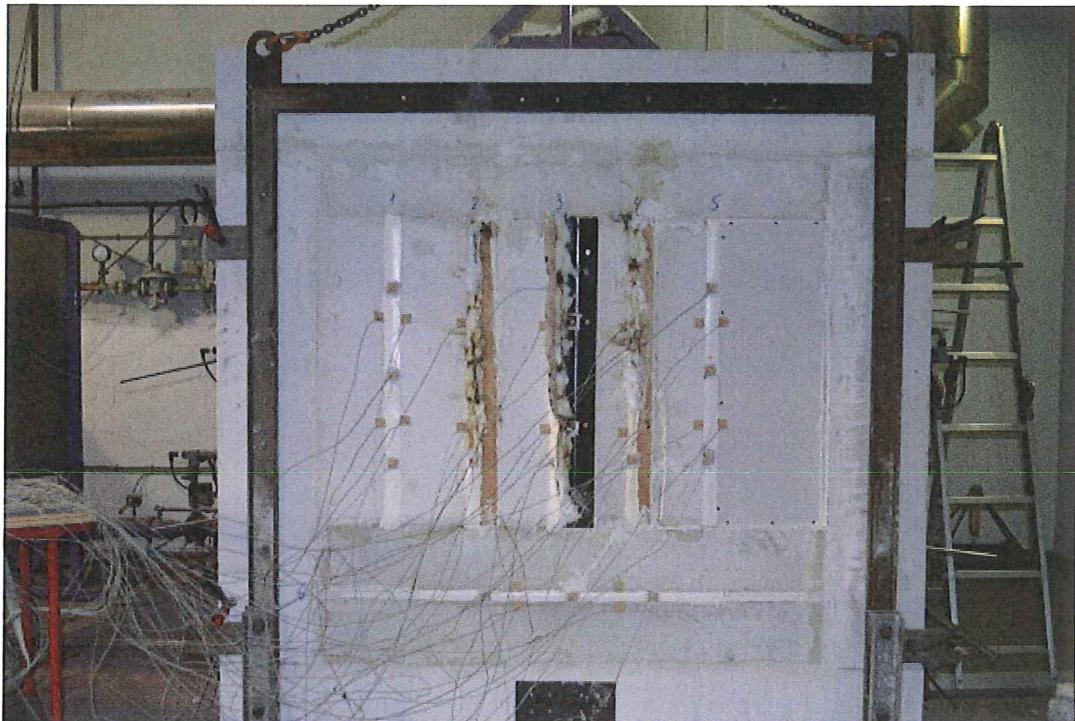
Unexposed side of test specimen after 120 minutes of testing
